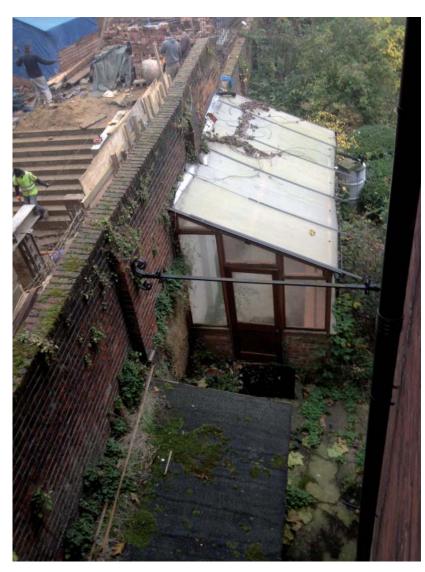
Outbuilding to be demolished to allow lower ground floor extension
